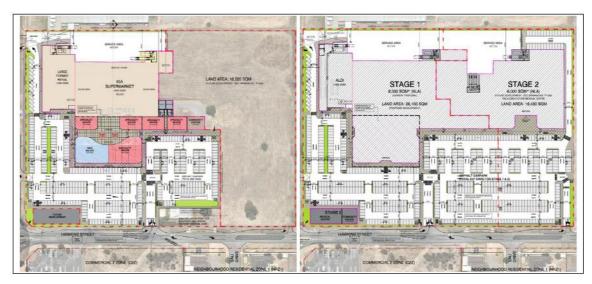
revised plans for the IGA redevelopment Stage 1 (left) and proposed Stage 2 (right) plans, submitted January 2017.
